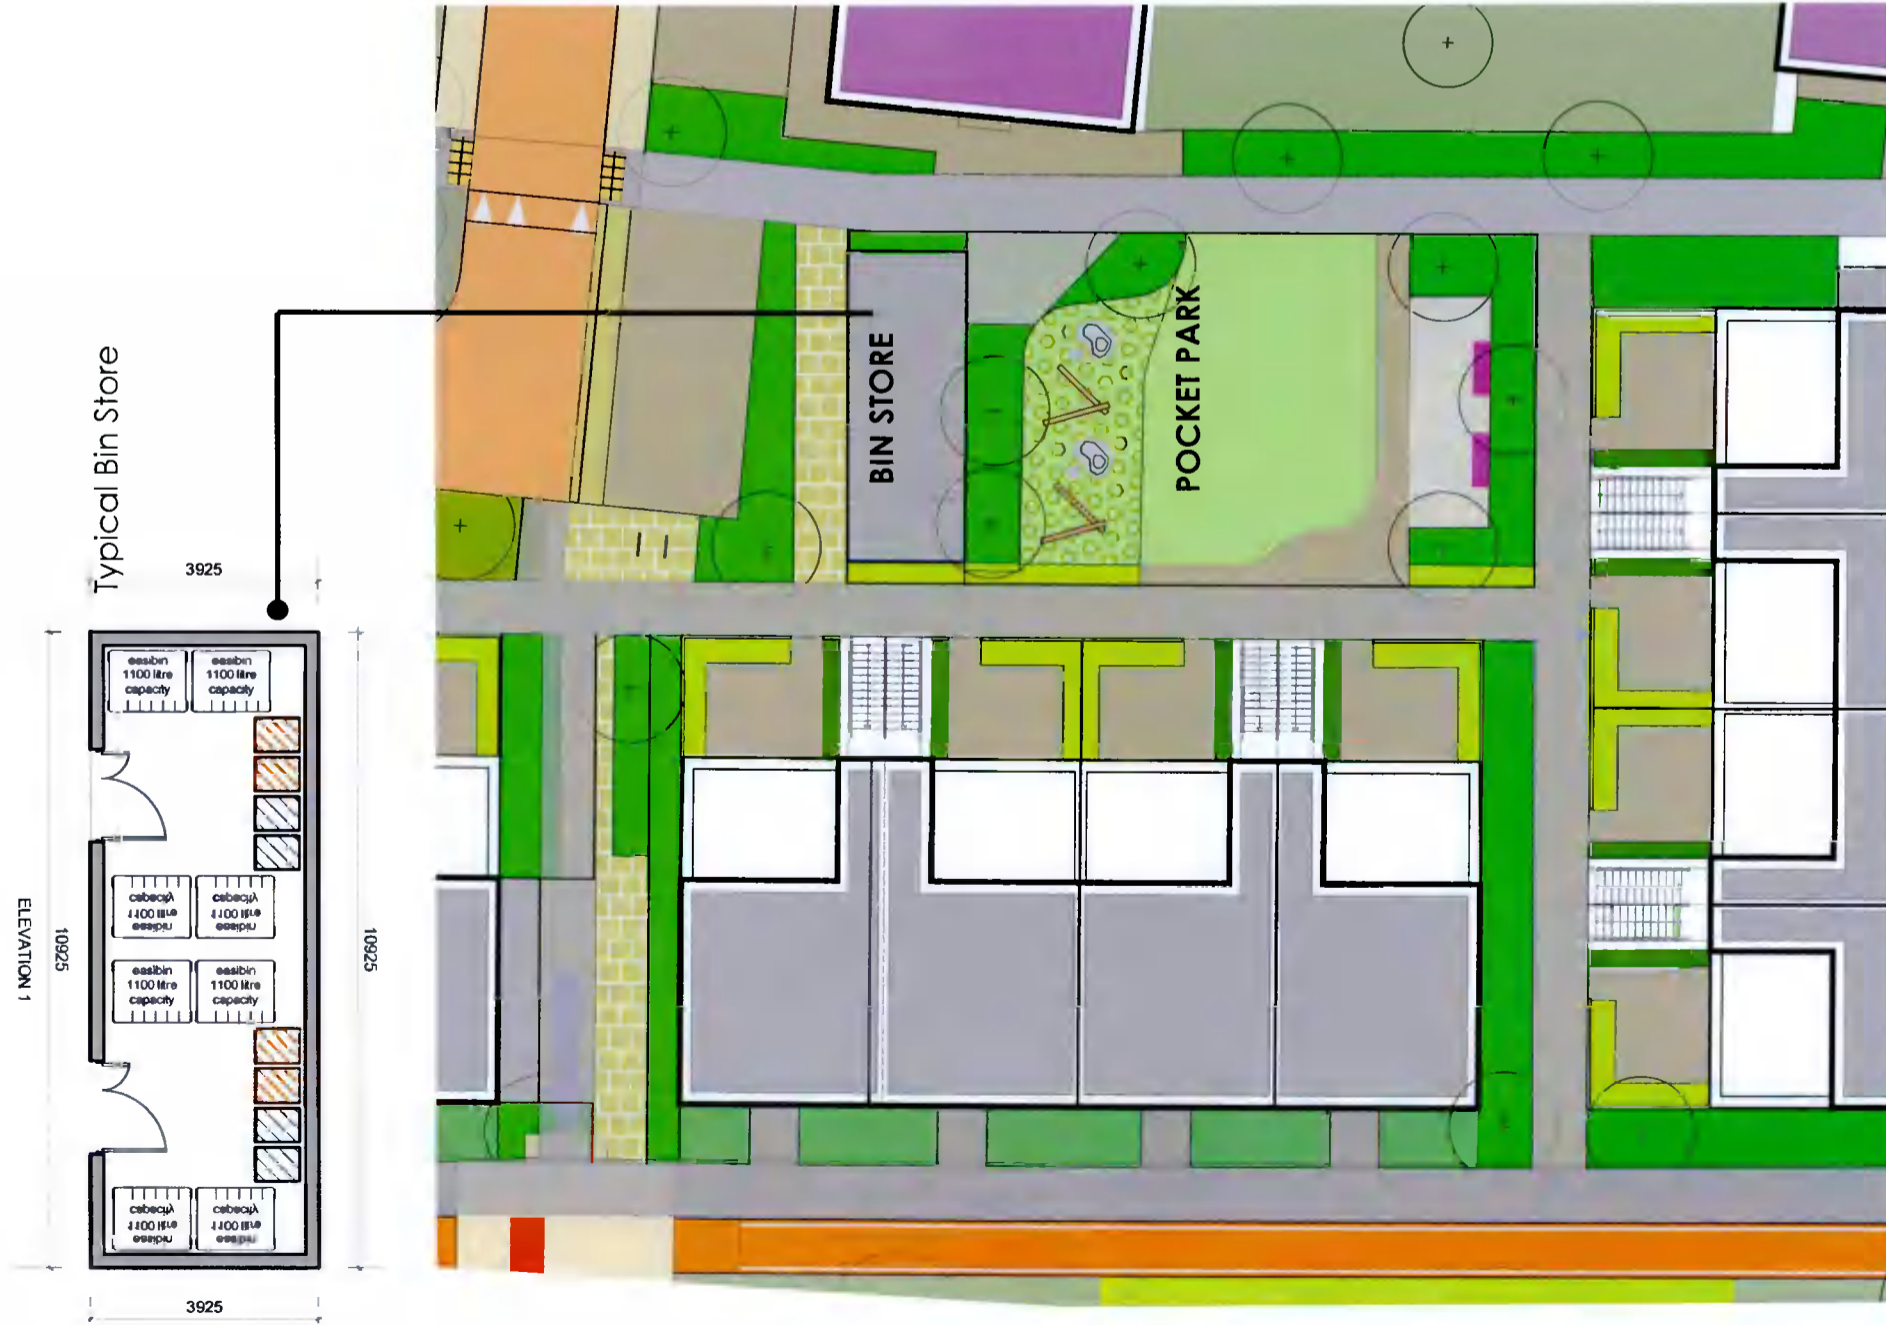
TYPICAL BIN STORE ARRANGEMENT
